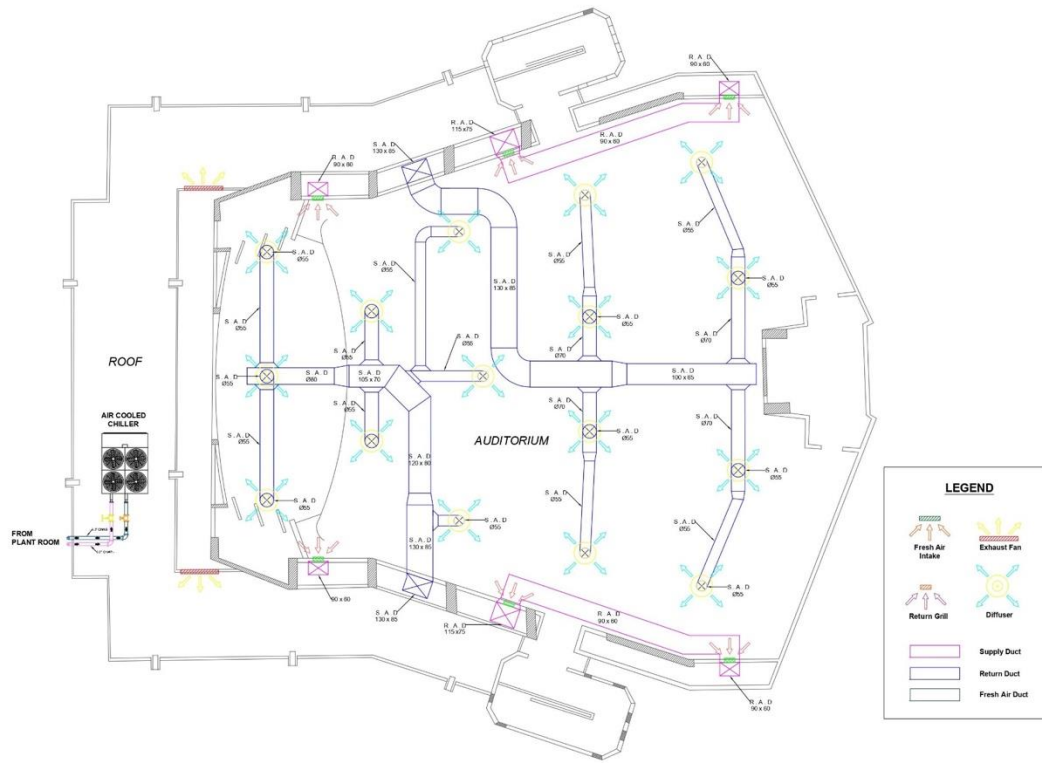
Figure XX.- Duct & Pipe Layout for Proposed System # 2
